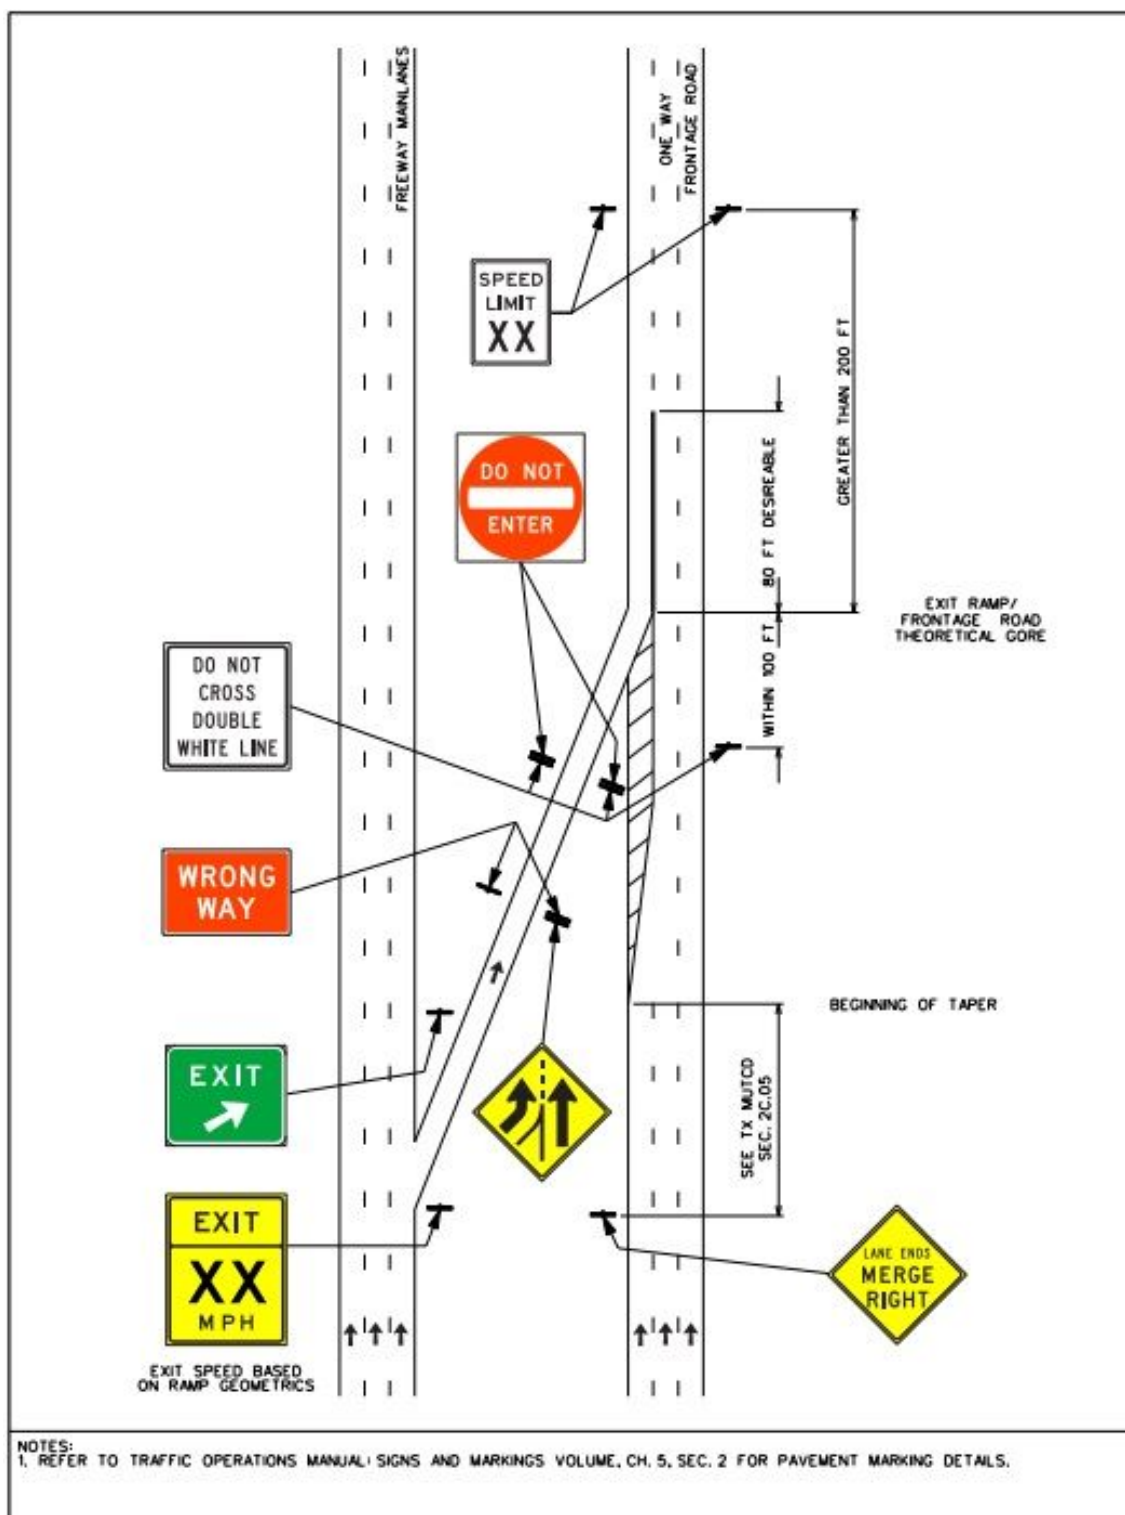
Typical signing for an exit ramp to a one-way frontage road – free lane available with lane reduction upstream of the ramp.
